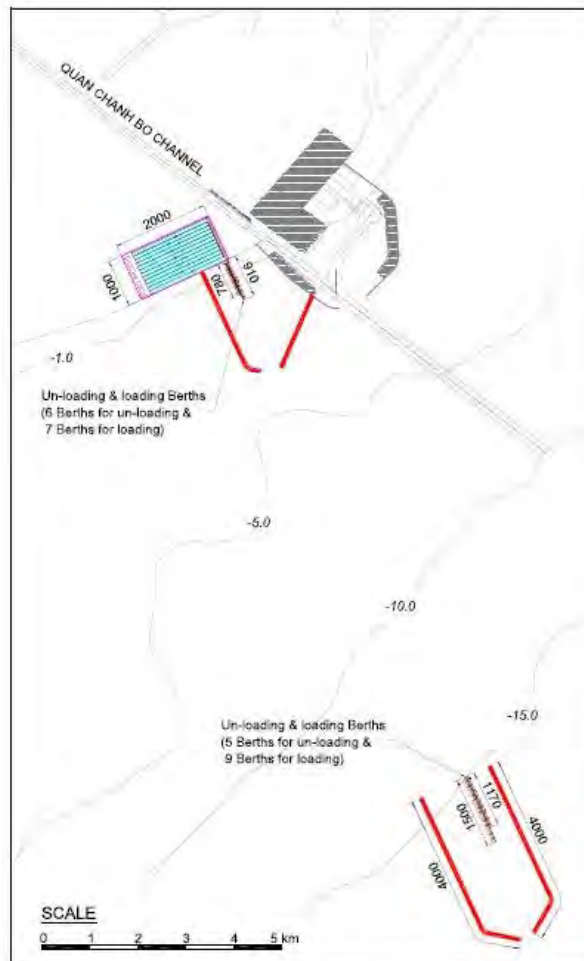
Layout of Fixed Type Imported Coal Transshipment Terminal in Tra Vinh (Without Trestle)
